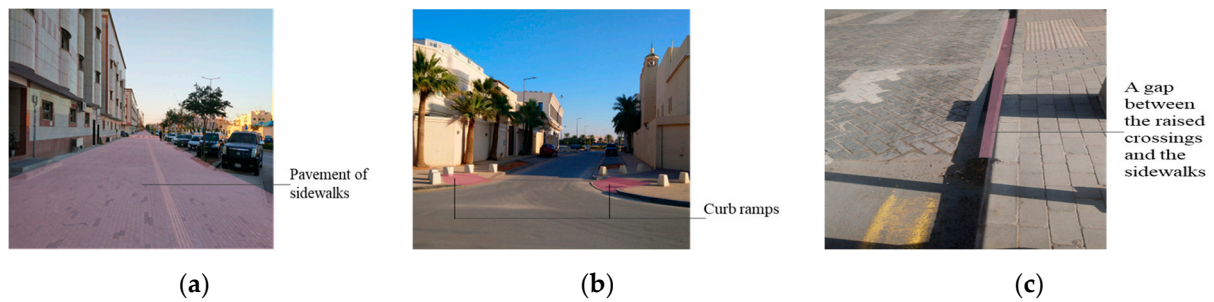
(a) Paved sidewalks; (b) Curb ramps that facilitate and encourage walking; (c) Gaps between the raised crossings and the sidewalk. Source: Authors.
